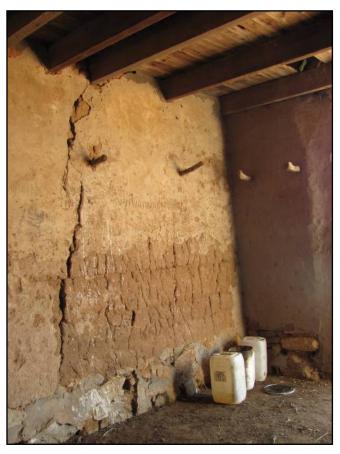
Inside of barn showing wooden ceiling, mud brick walls and wooden pegs.
